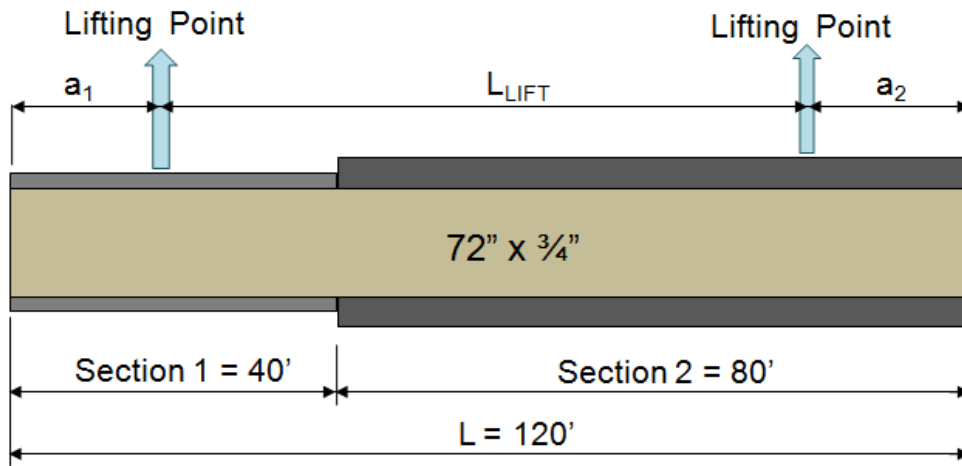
Two Cross Section Girder Schematic (40' - 80')
